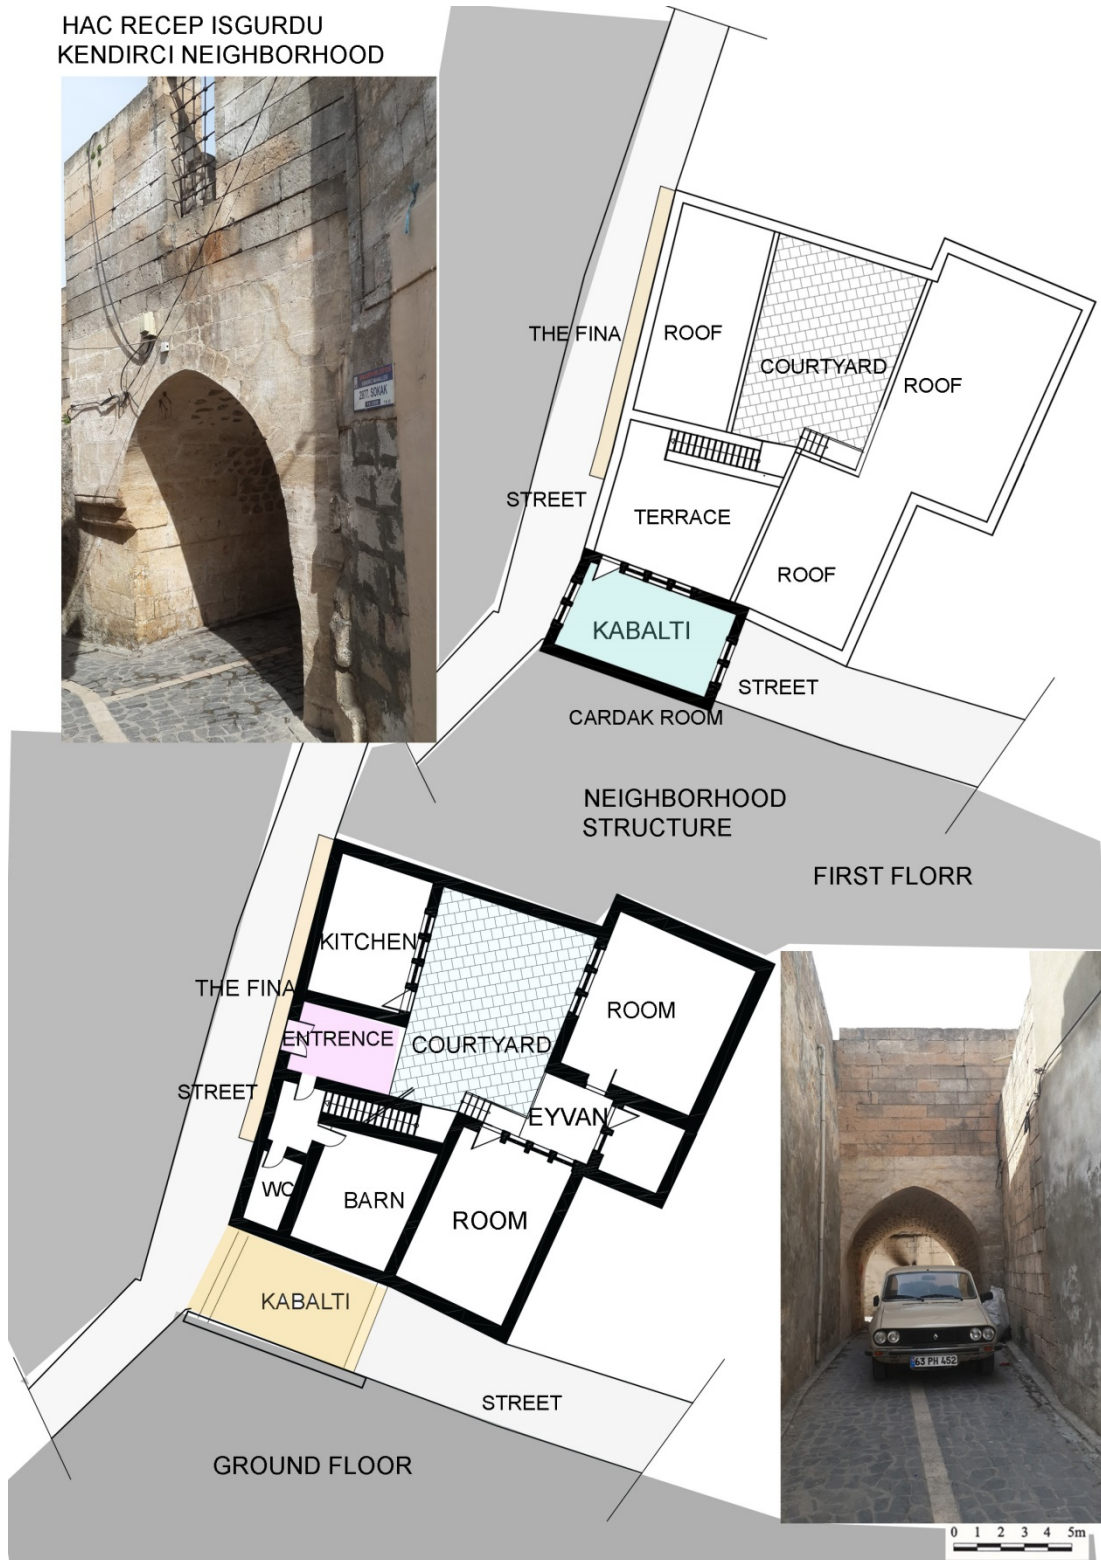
The first floor plan of Hac Recep Isgurdu Kabalti house
